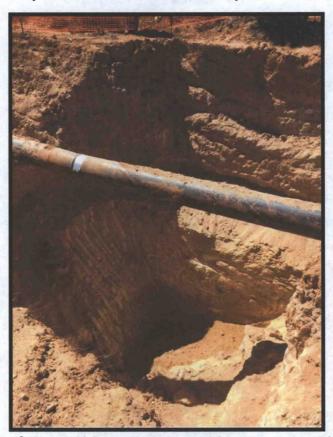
Trunk K #9 Excavation encountered Sandstone at about 7 feet BGS.
